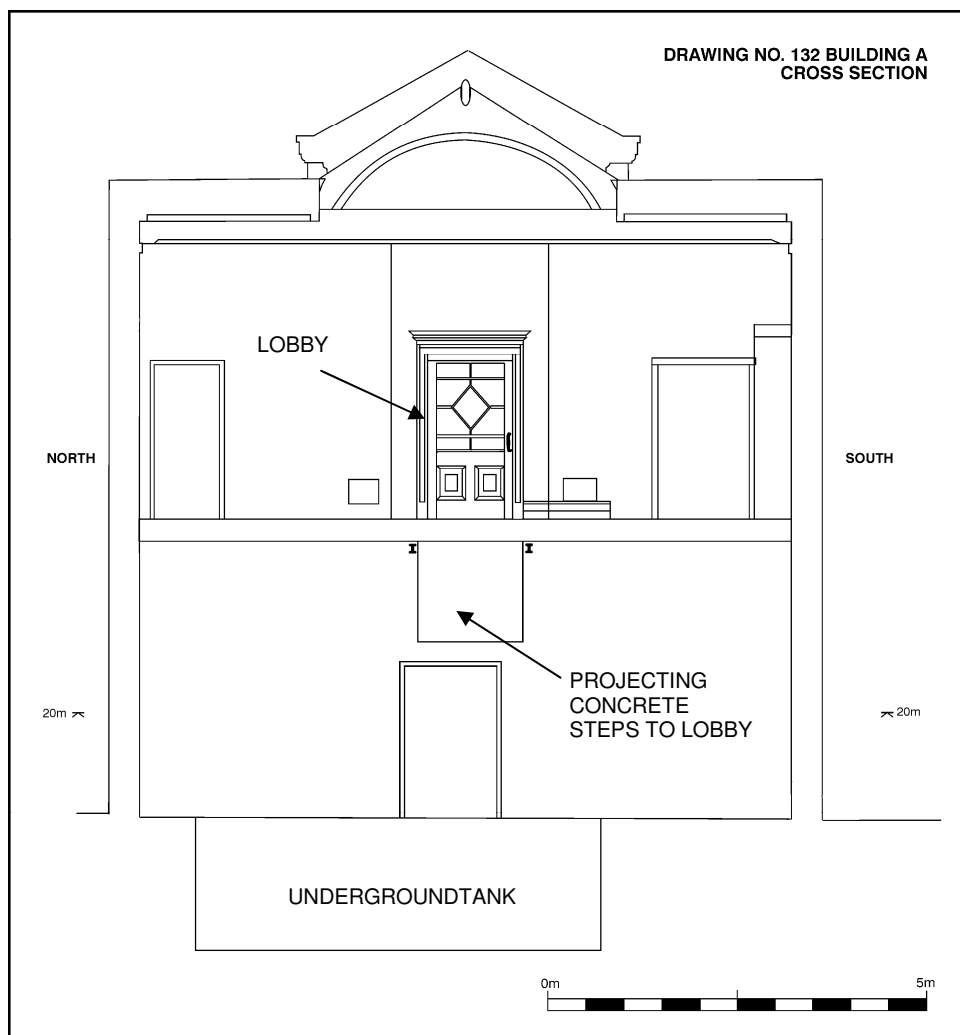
Cross-section of the eastern end of Building A (scale 1:100)
